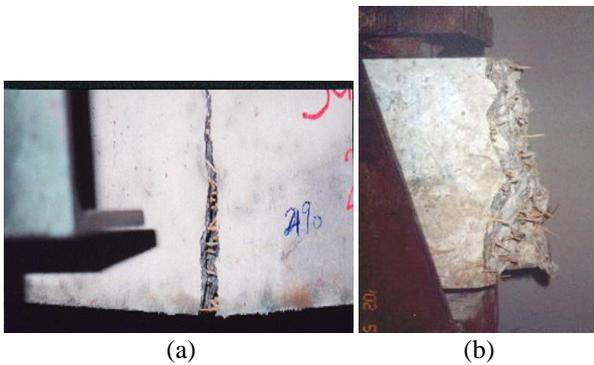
Concrete reinforced with OPTF; (a) specimen under bending showing OPTF as crack arrester and (b) broken specimen showing uniformly distributed OPTF in concrete.
